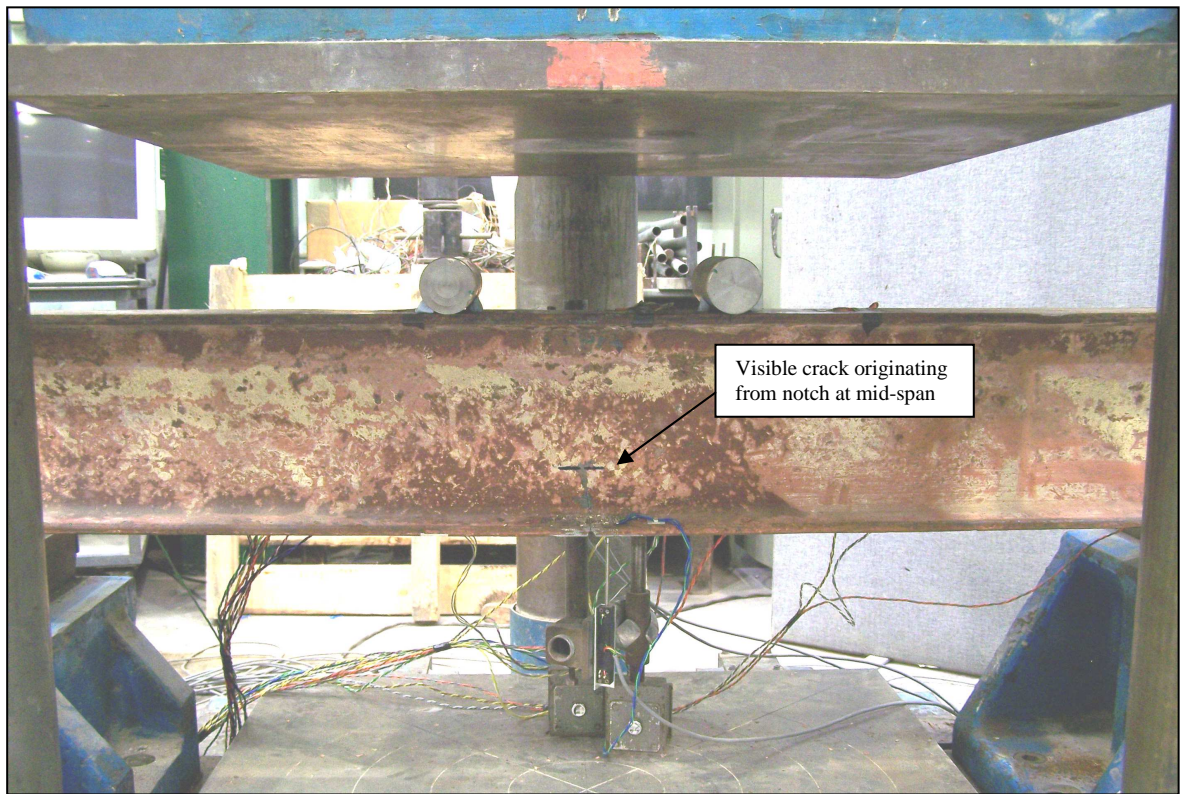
Notched beam after unloading following initial cracking at point C in Figure 3.11 (Photo by M.O'Sullivan 2008)
